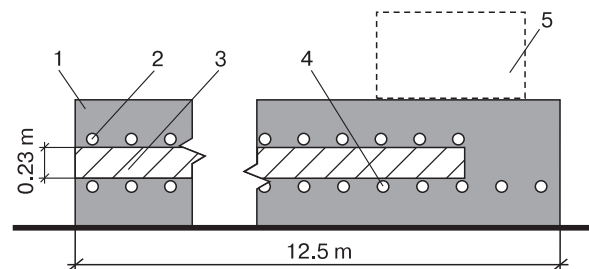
Longitudinal cross section of precast concrete foundation module.
